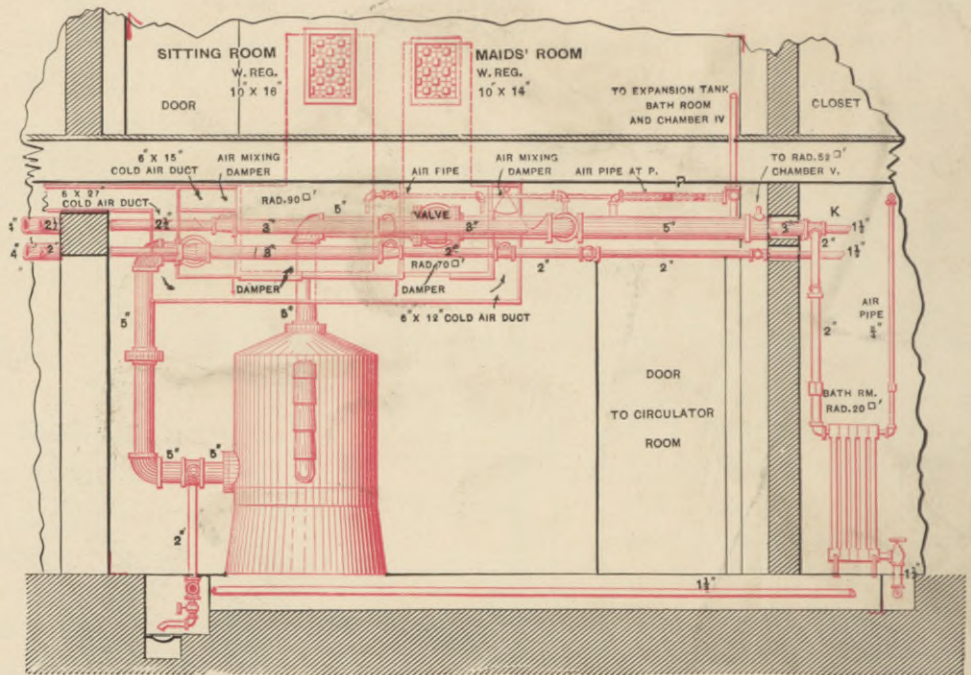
Elevation in Laundry Looking Toward Heater Room.
